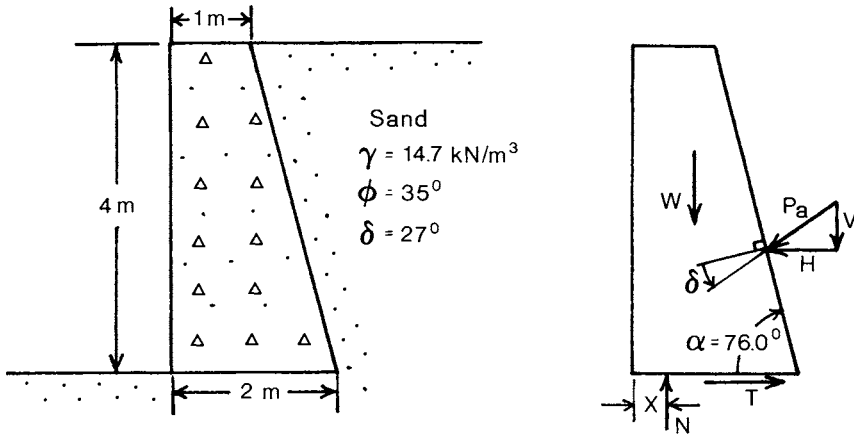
Gravity retaining wall of Problem 6.4.
